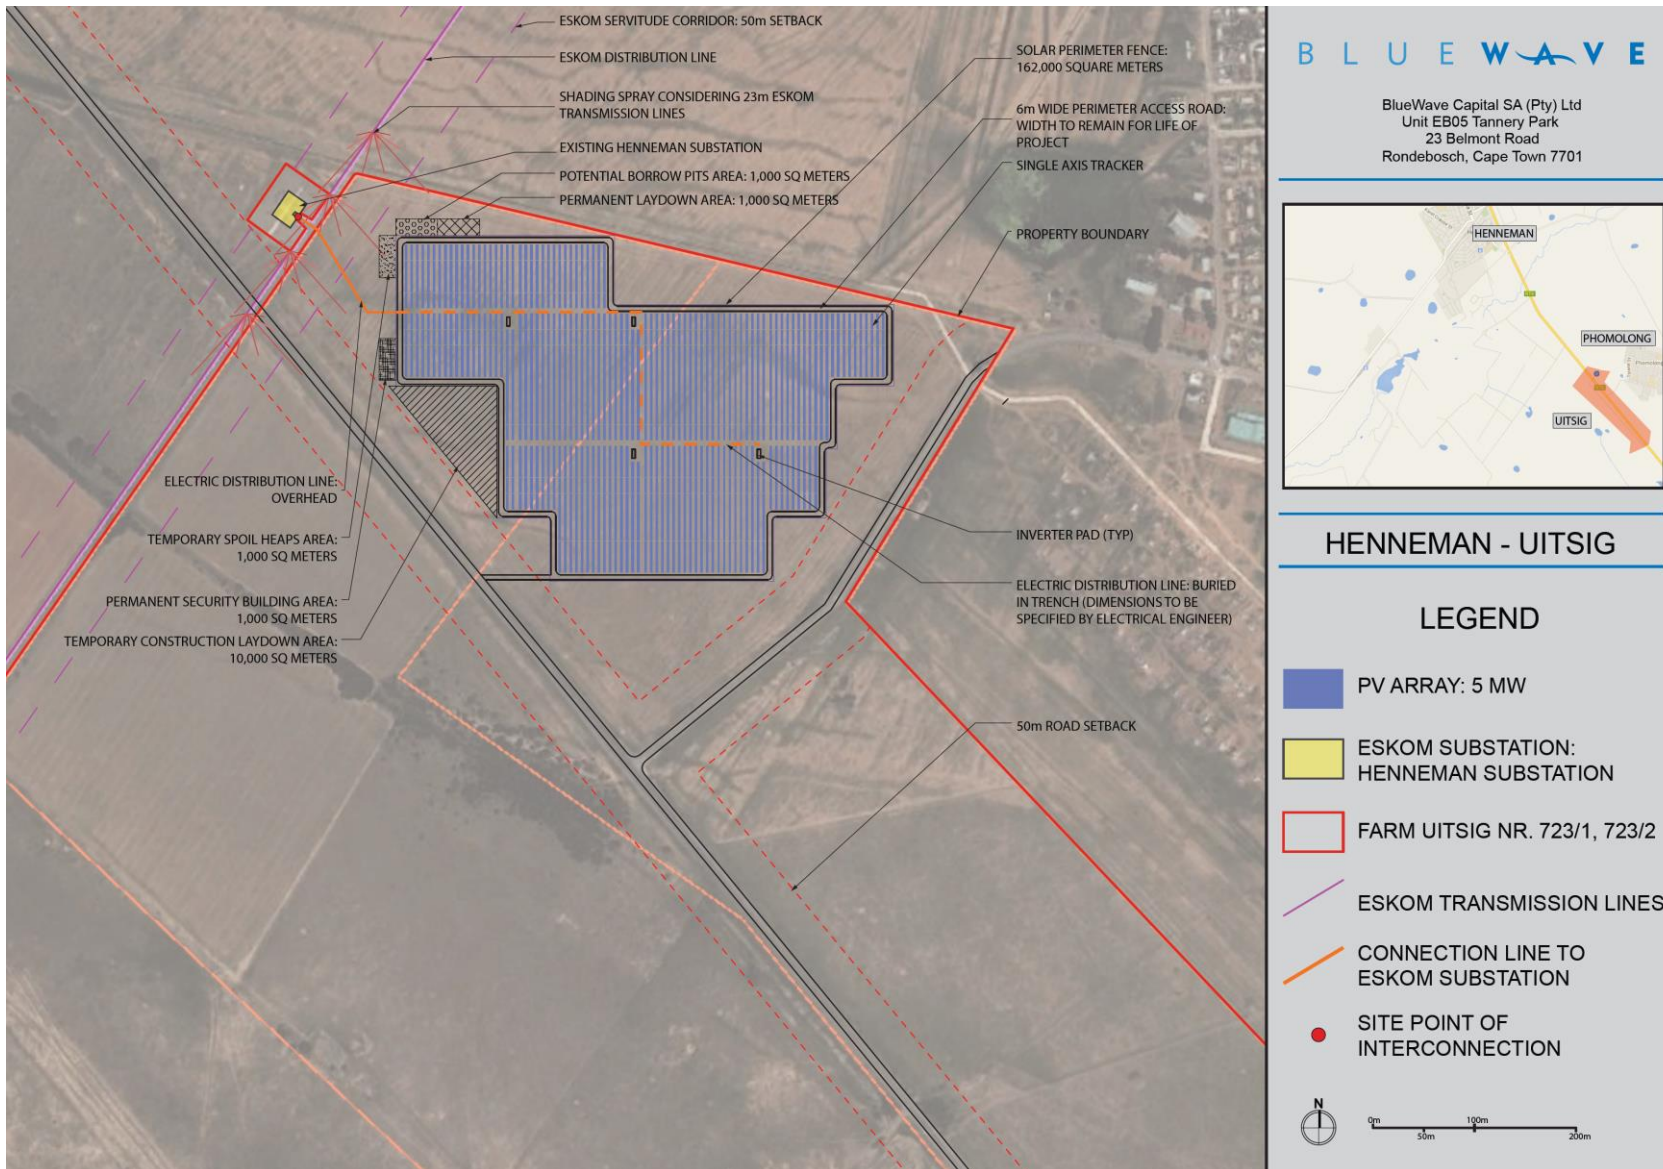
Layout plan within preferred site alternative (site alternative 1)
